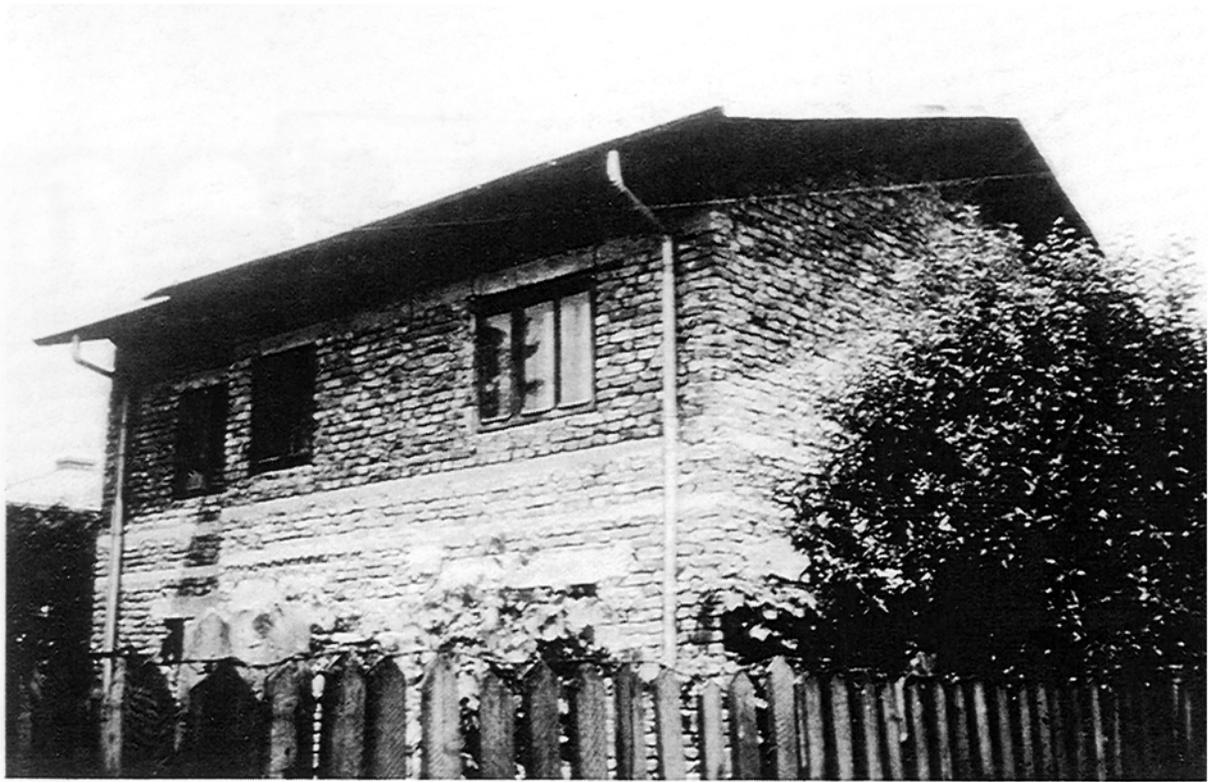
Two storey brick masonry house with RC slab, RC lintels and ring beam in the ground floor.
